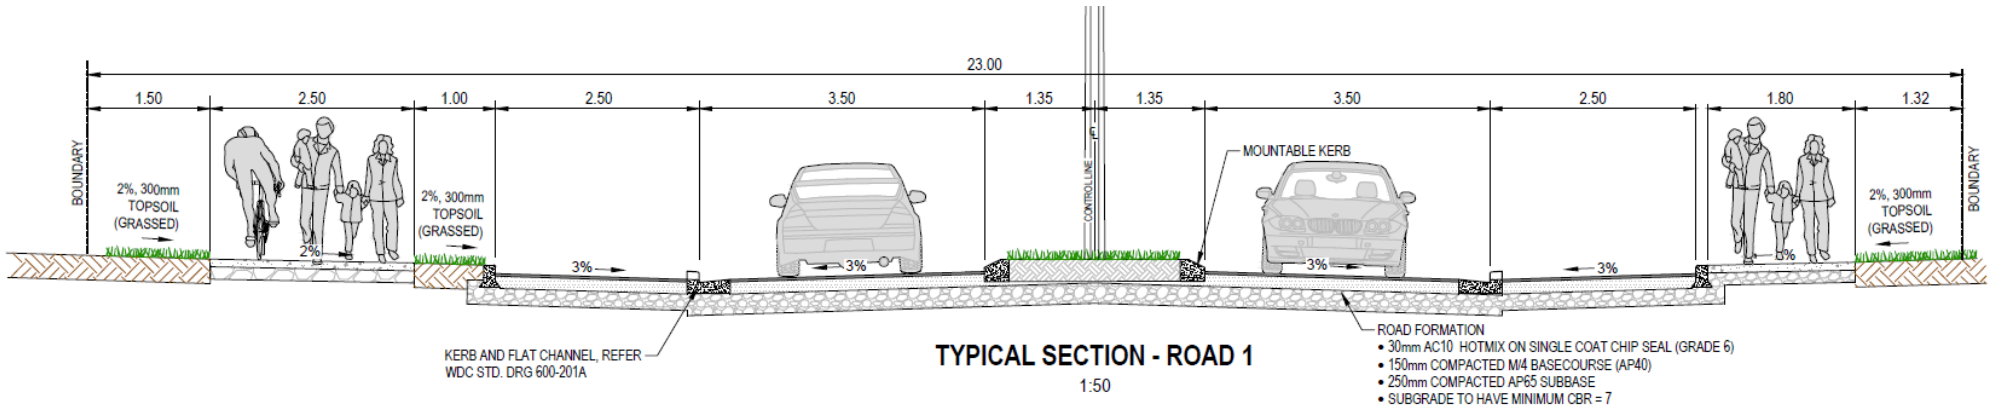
Typical Cross Section for Road 1 North of Cam River
